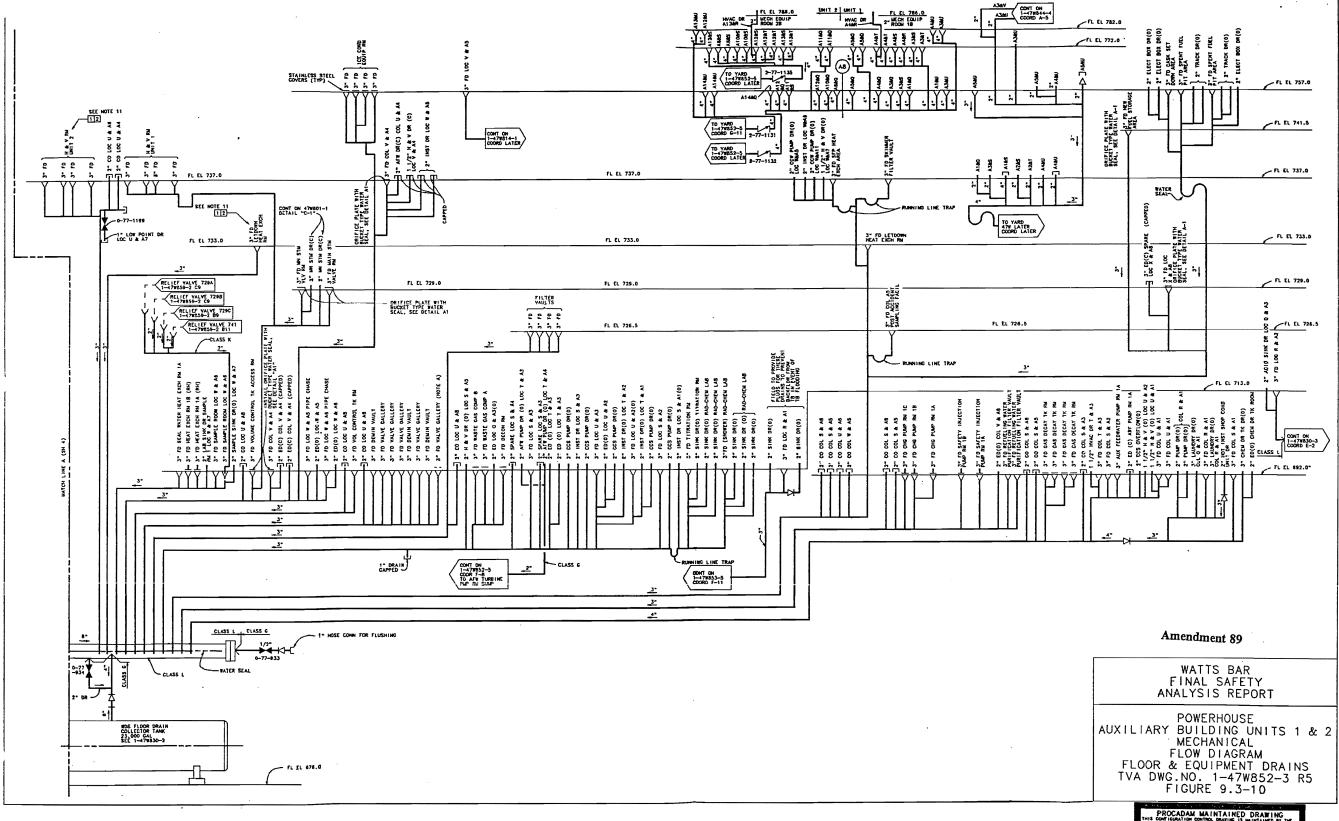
Powerhouse, Auxiliary Building Units 1 & 2 Flow Diagram - Floor and Equipment Drains
